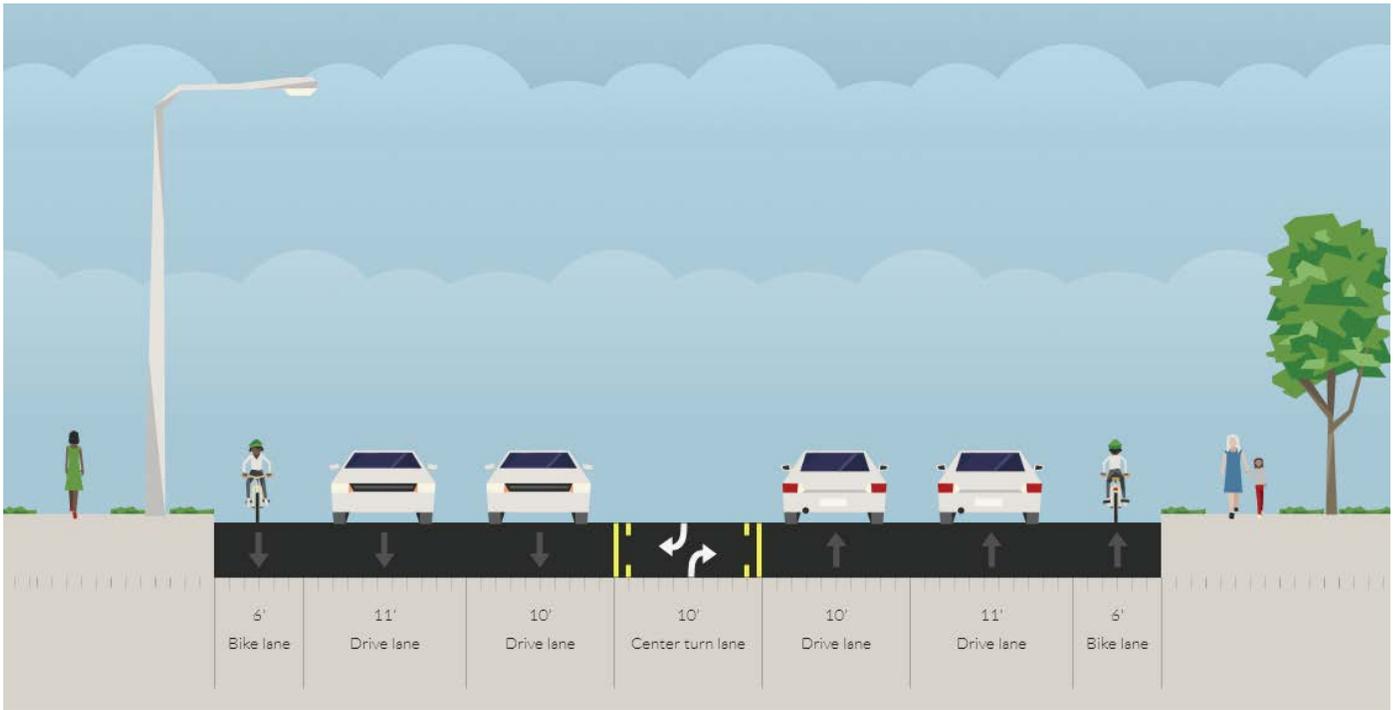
Typical four-lane roadway after road diet / 64 feet FOC
